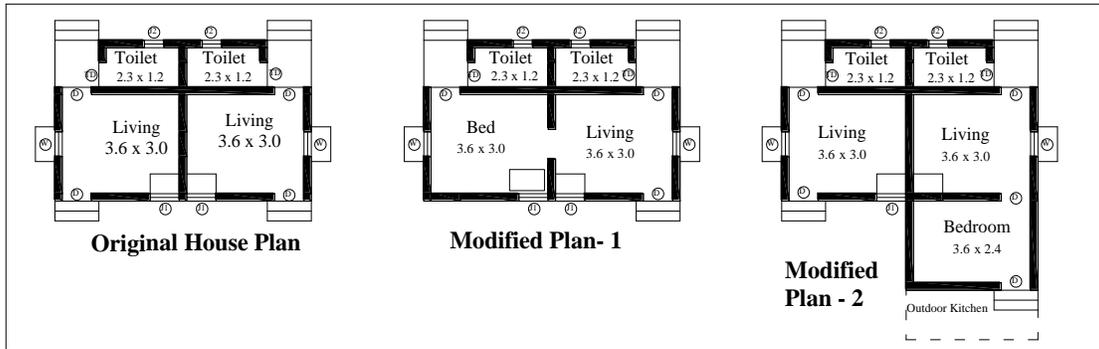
Plan of typical house and modified houses at Vilacheri, Madurai
